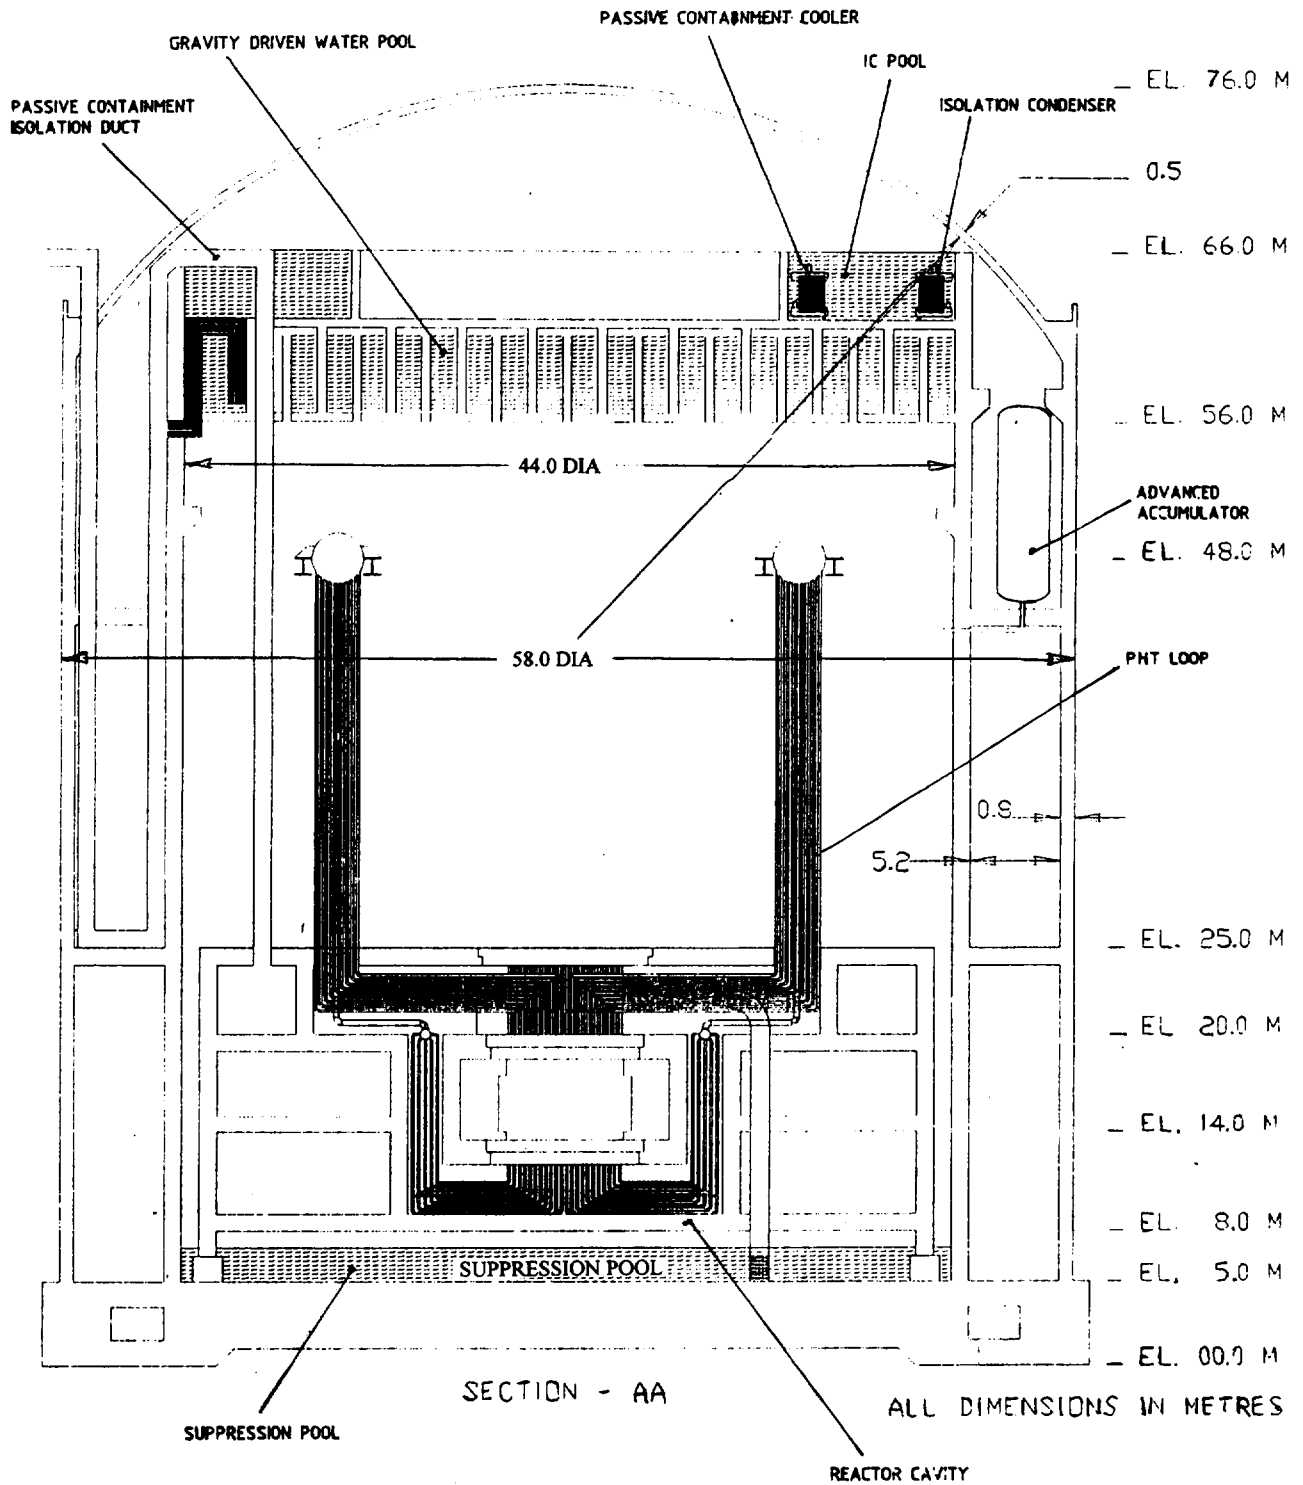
AHWR REACTOR BUILDING ELEVATION
